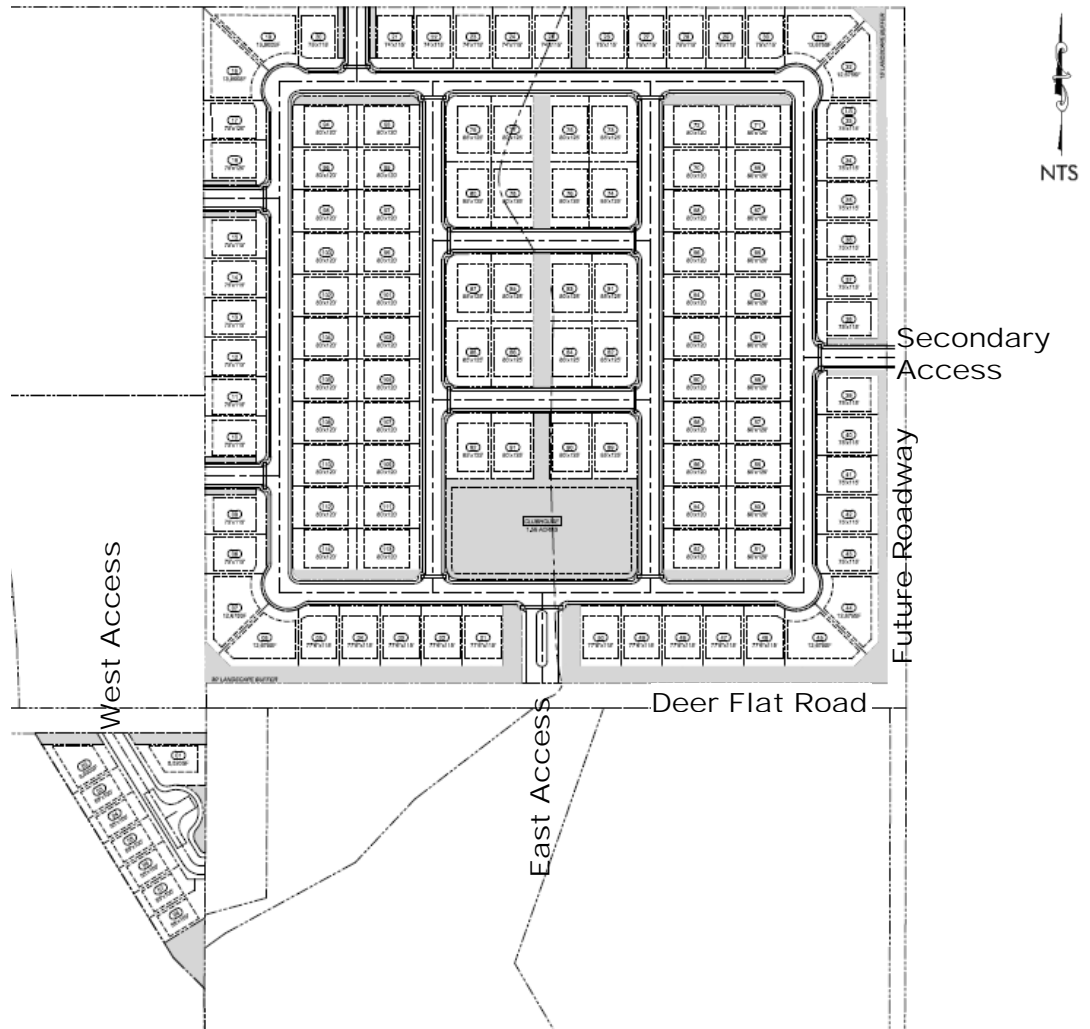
shows the preliminary site plan with proposed access locations. Deer Flat Subdivision is a proposed residential development containing 122 single-family lots, with 8 lots south of Deer Flat Road and 114 lots north of Deer Flat Road. The expected build-out year is 2025. The development is proposing one full access point on Deer Flat Road for the northern portion. For the southern portion, the development is consolidating three existing driveways into one full access approach.
